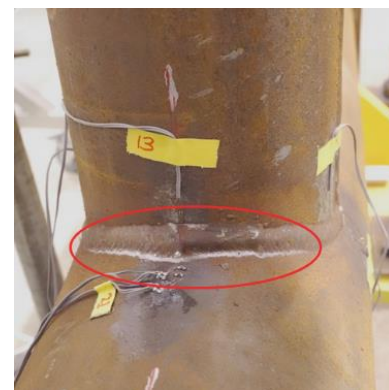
Typical failure mode of S690 welded T-joints under in-plane bending
